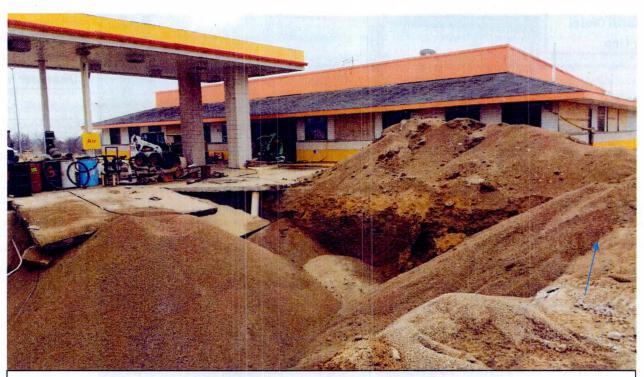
PHOTOGRAPH OF THE SOUTHEASTERN PORTION OF THE EXCAVATION
